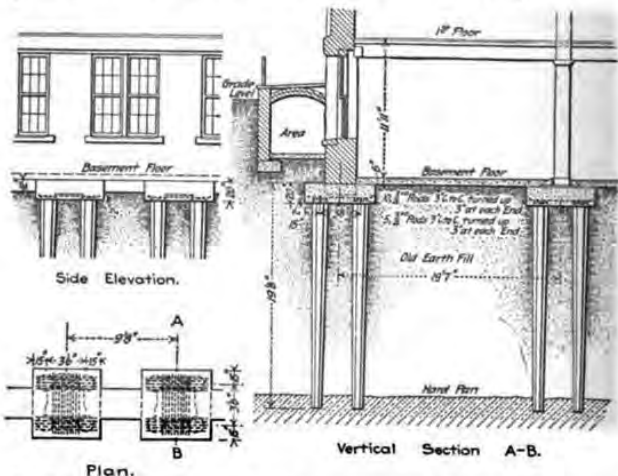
Gilbreth Pile Foundation for Lattemann Building, Brooklyn, N. Y.
